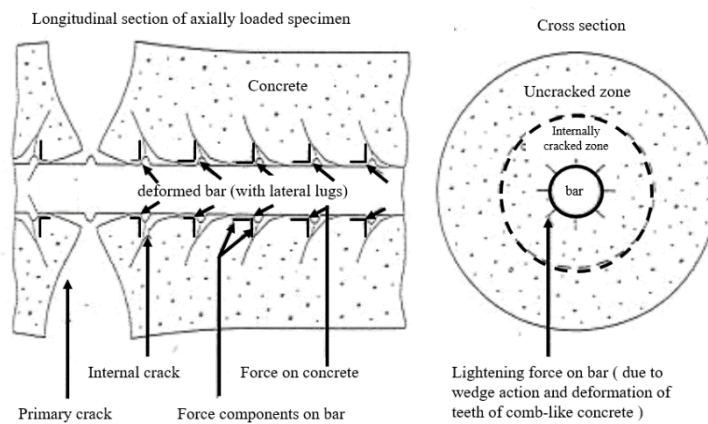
Internal cracks around the reinforcing rebar embedded in concrete (Goto, 1971).
